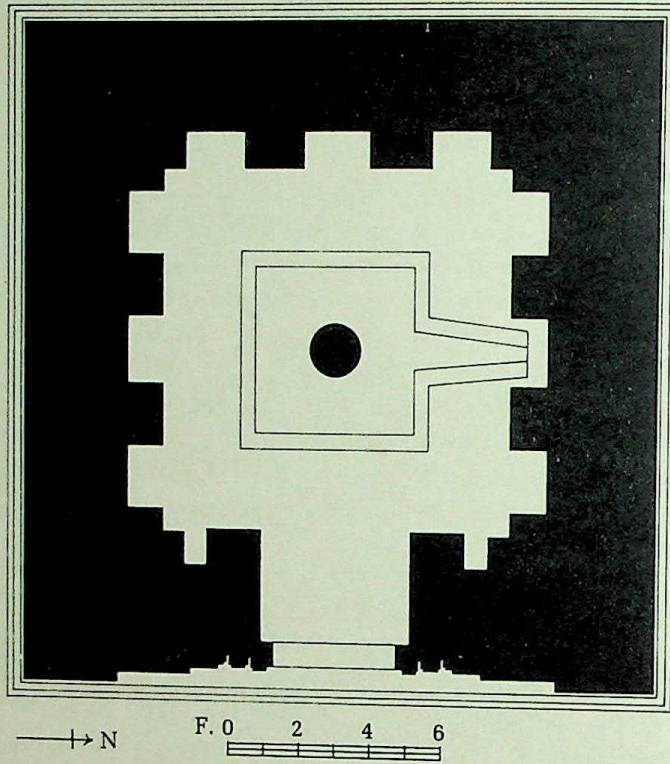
Ālampur. Viśva-Brahmā temple, plan.
